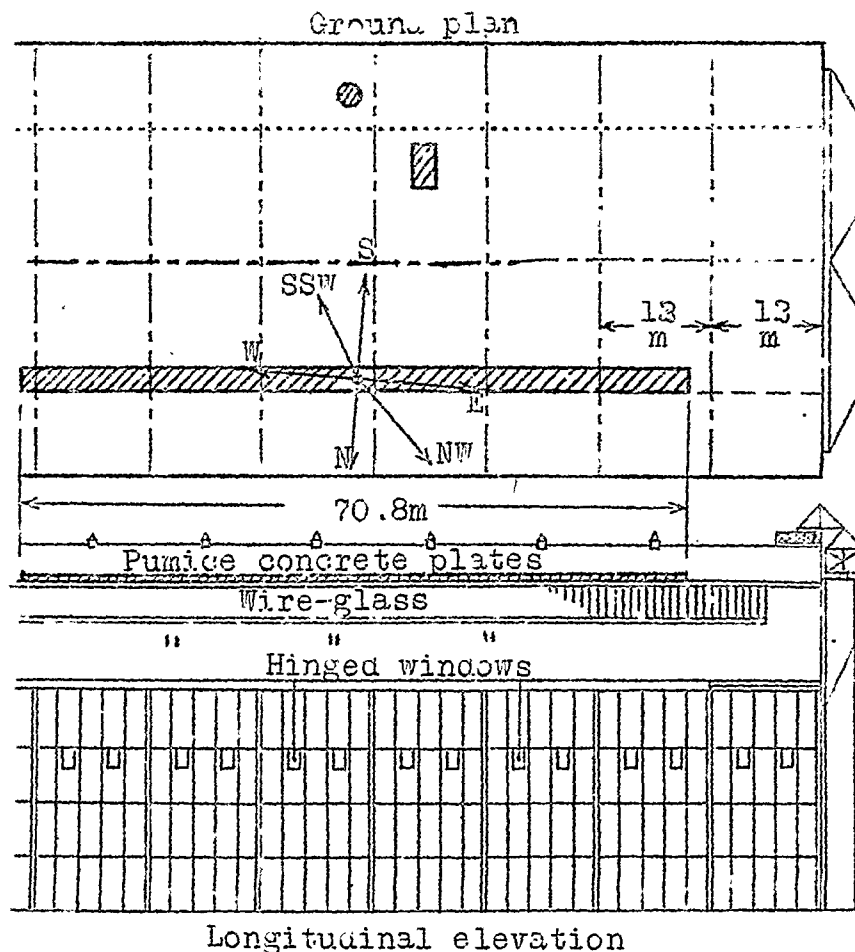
Ground plan and longitudinal elevation of damaged portion of airship shed "Nord" in Staaken. The cross hatching indicates damaged portions of shed roof.
